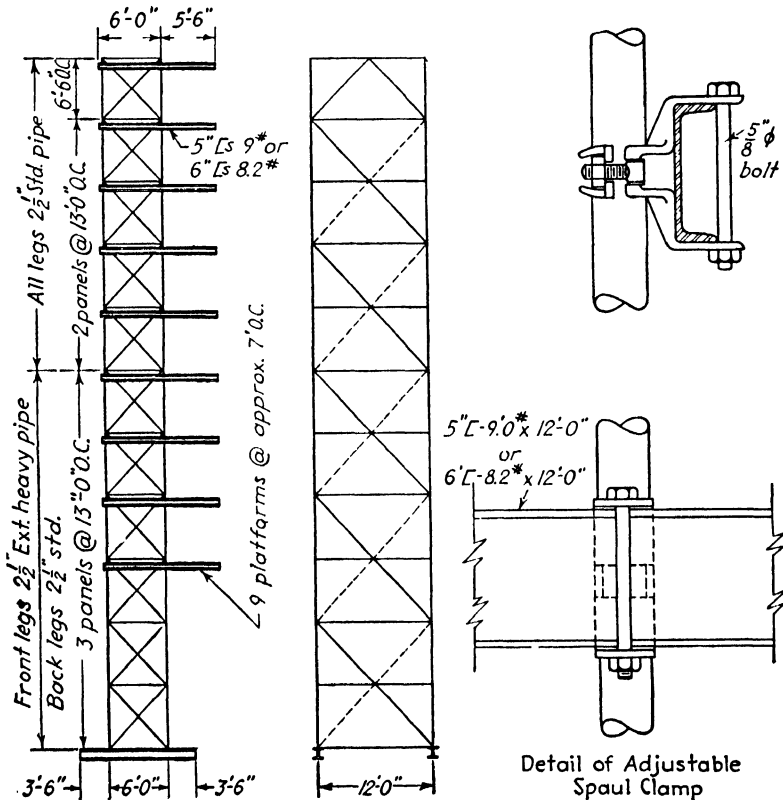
Clamp used in connection with 5- and 6-in. channel spaul. (Courtesy of Dravo Corp.)
